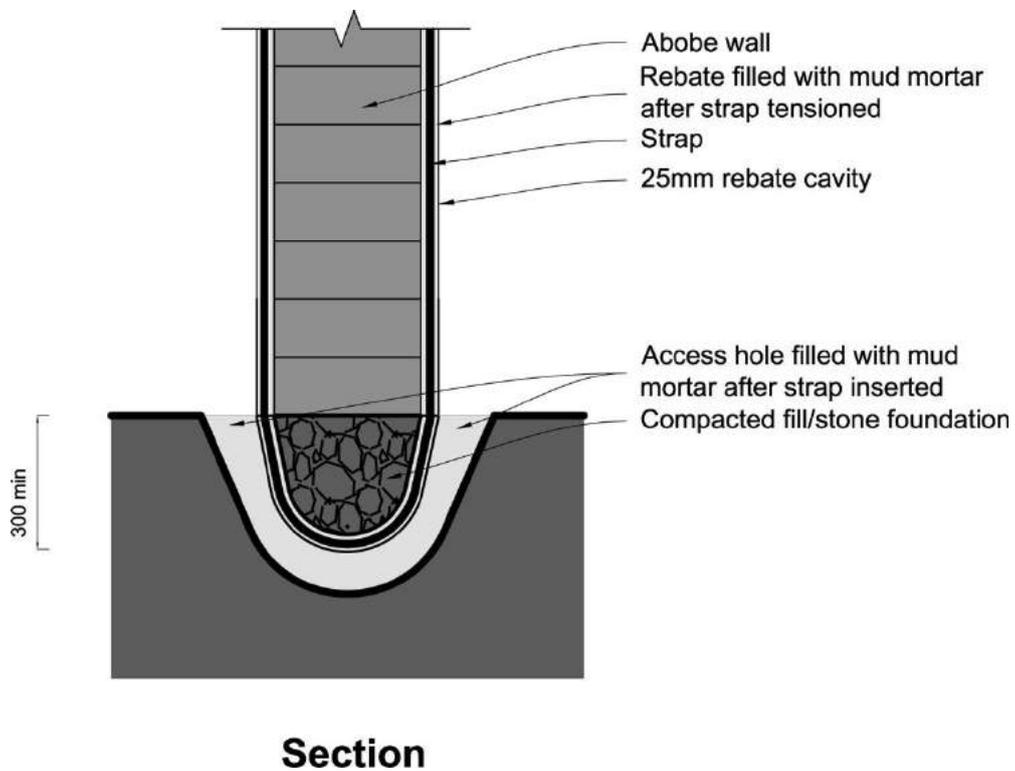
(b) Section through a wall showing a strap passing under the foundation of an existing wall.
